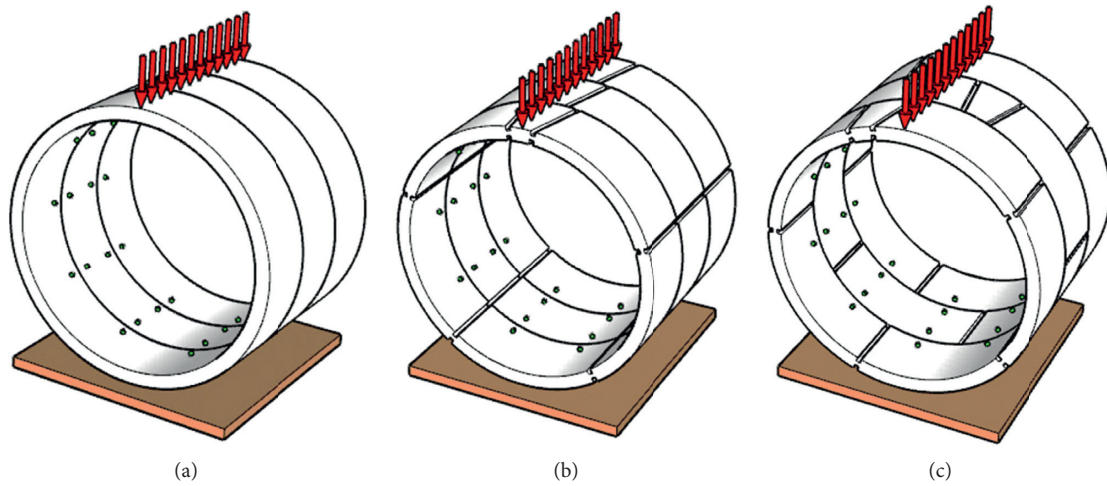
Three types of segmental lining. (a) Uniform rings. (b) Straight-jointed rings. (c) Stagger-jointed rings.
